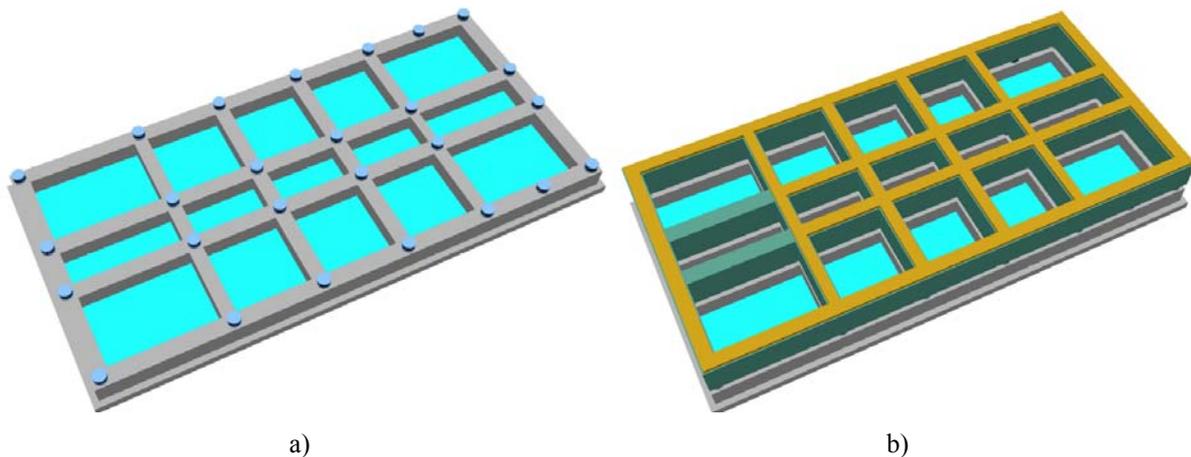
a) Layout of the lead rubber bearings. b) Spatial view of the isolated structure of foundation.
